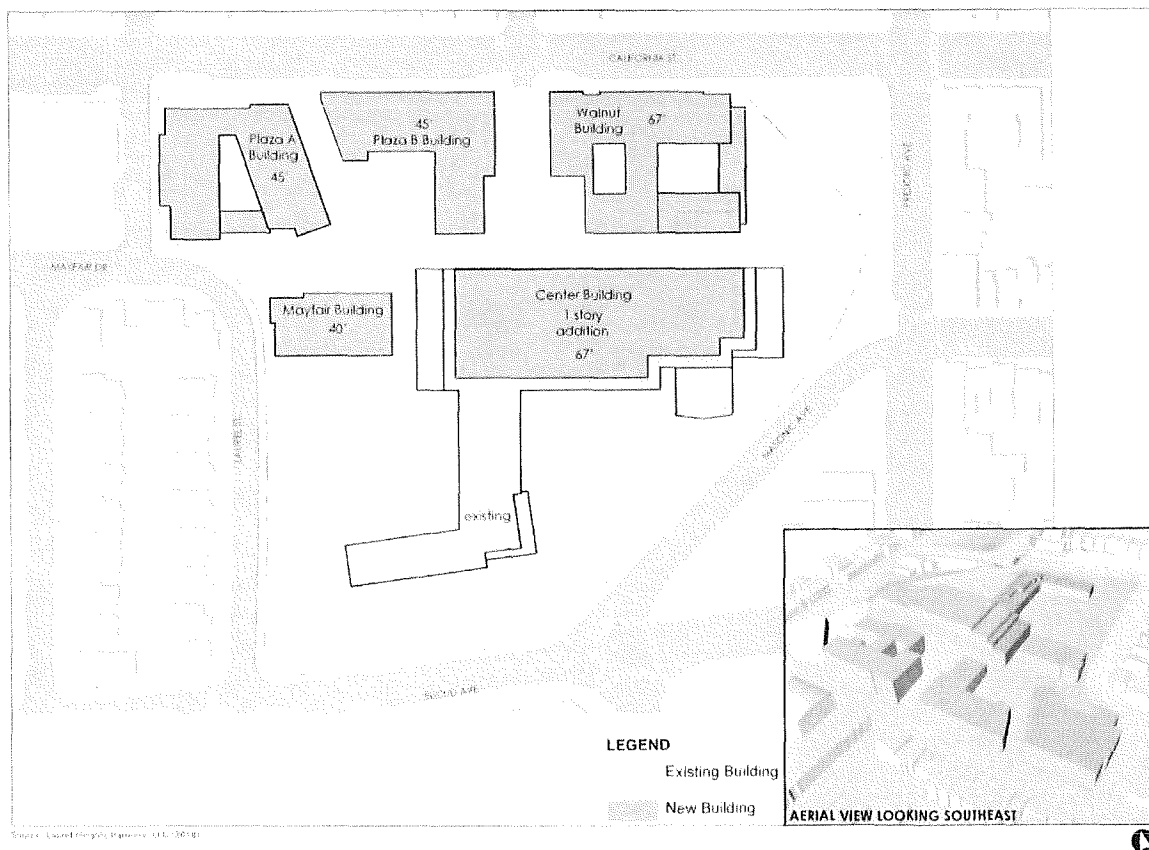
ALTERNATIVE C: FULL PRESERVATION - RESIDENTIAL ALTERNATIVE SITE PLAN
